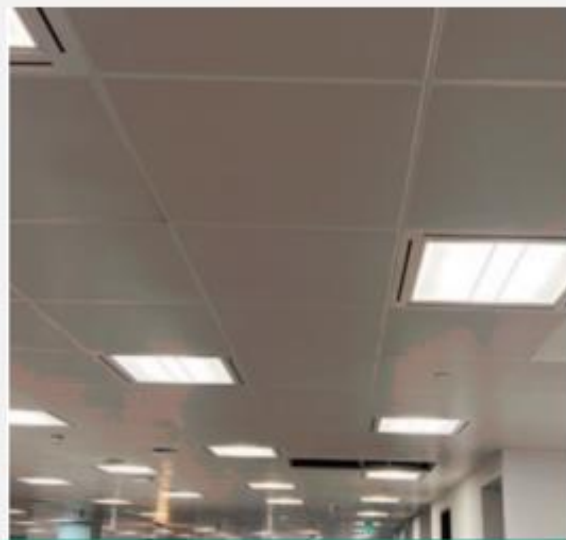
The condition of existing ceiling tiles allows for on-site or offsite reuse, whilst plasterboard has the potential to be recycled back into gypsum.
